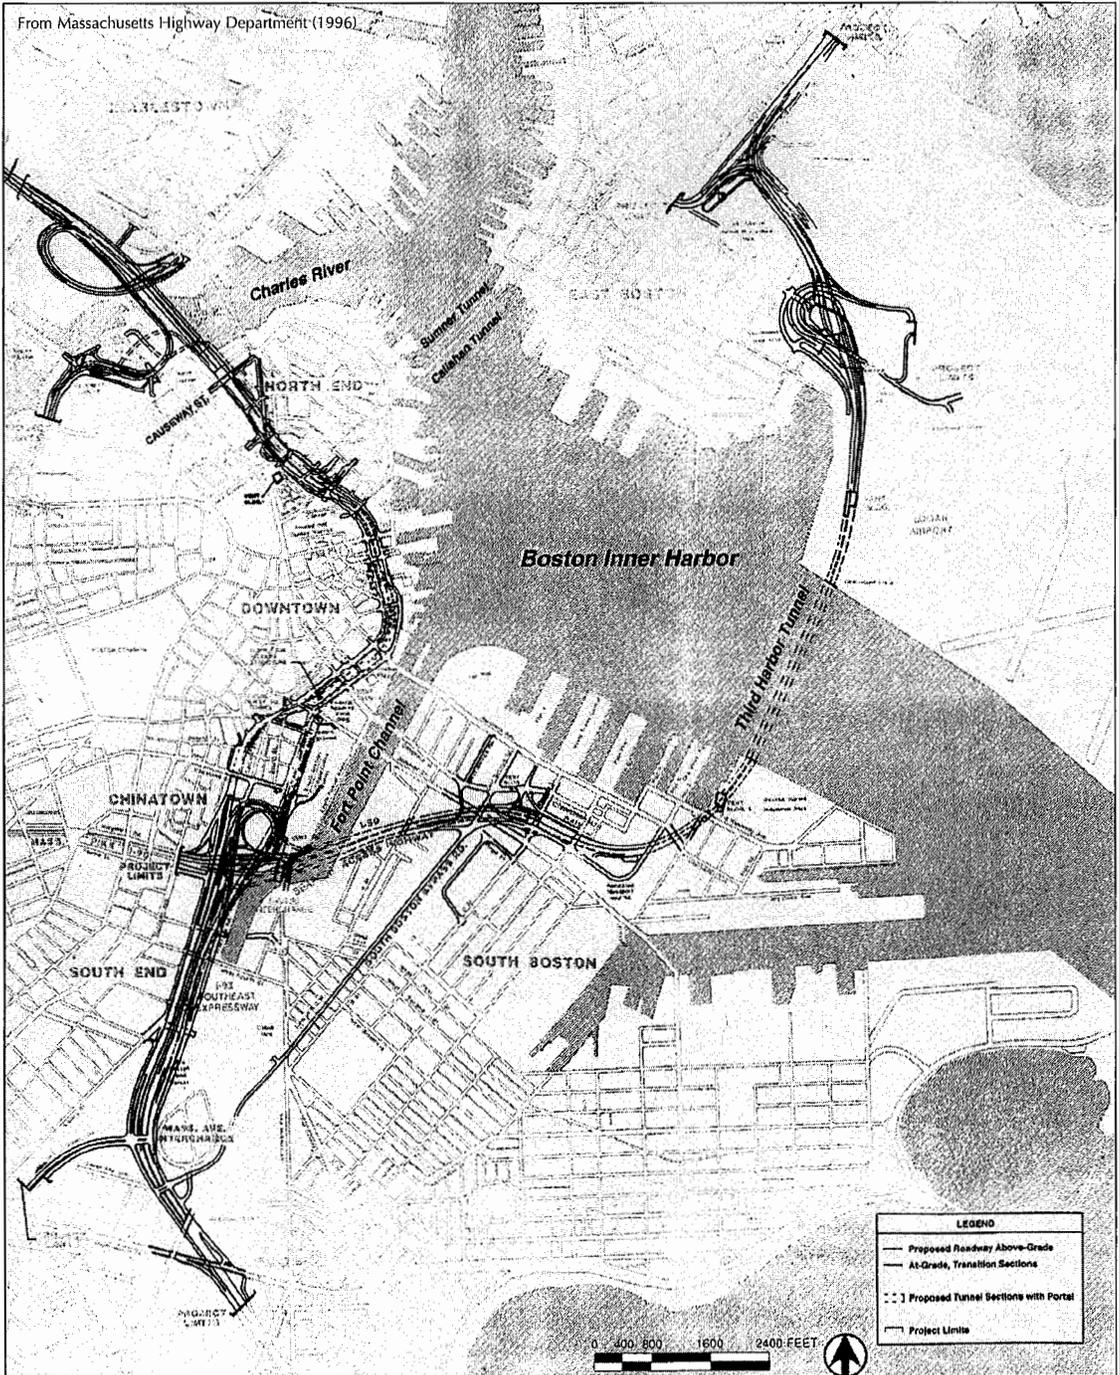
Plan of the Interstate 93 Central Artery/Tunnel routes.
